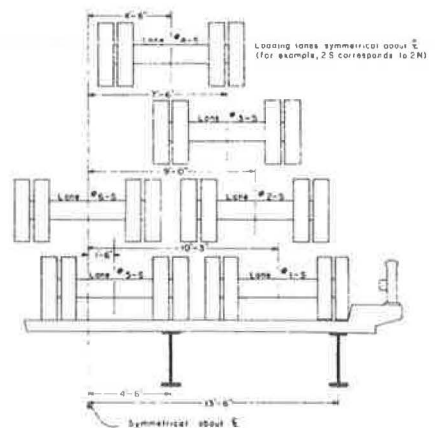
Cross-section showing test "lanes" for the steel stringer bridge.
